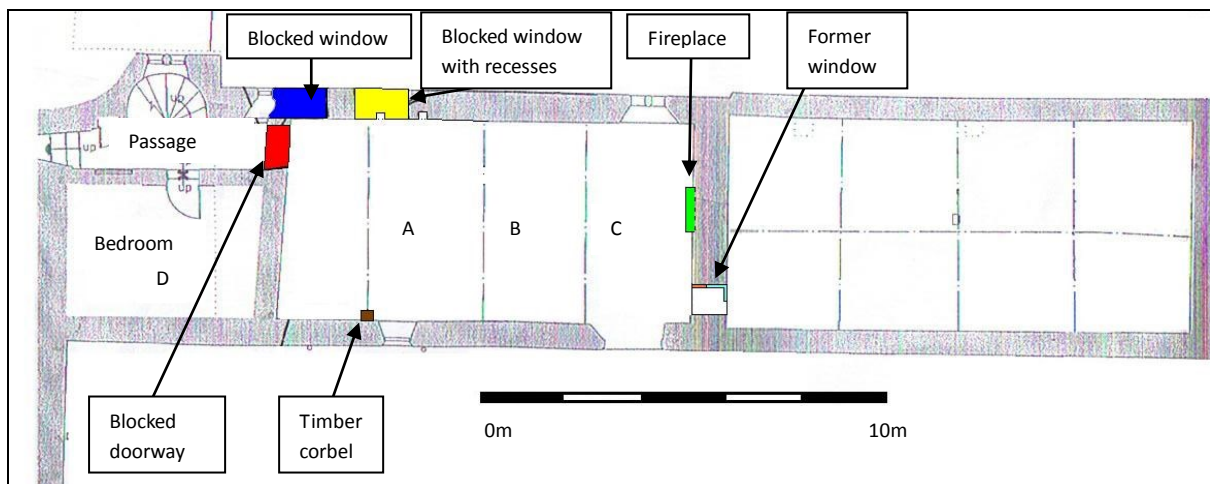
Plan of the first floor hall and roof space of the Victorian barn
